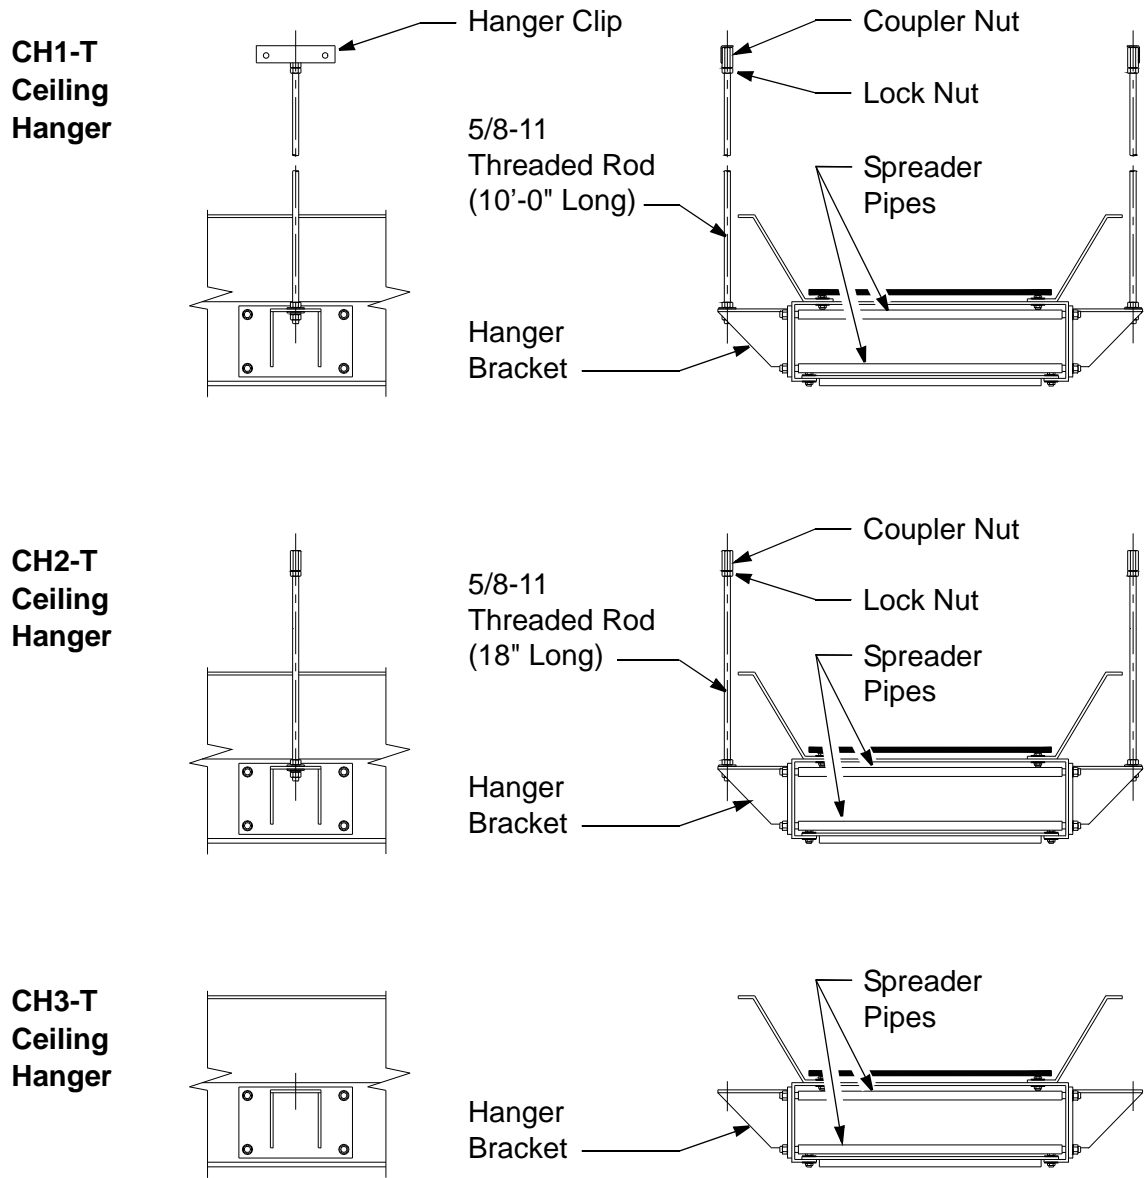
CH1-T, CH2-T & CH3-T Ceiling Hangers
